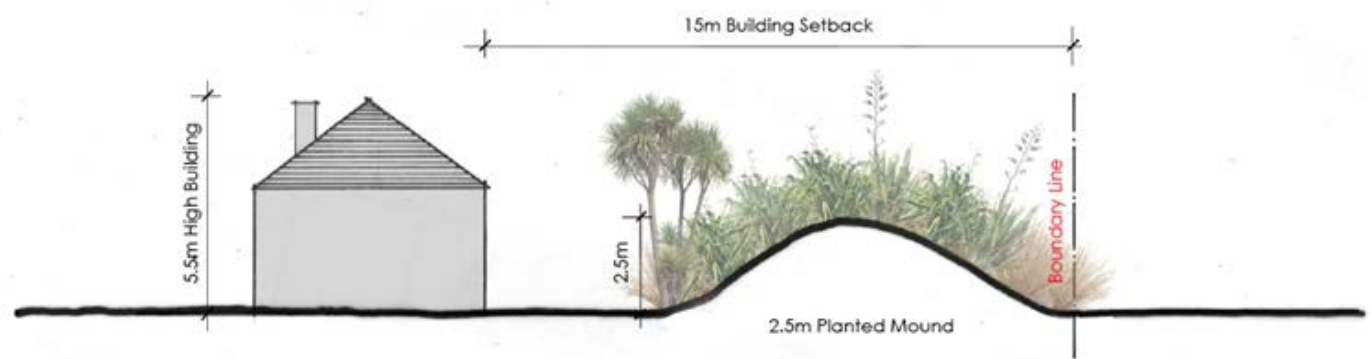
3. Ballantyne Road Low Density Residential Zone Mounding Plan Cross Section
